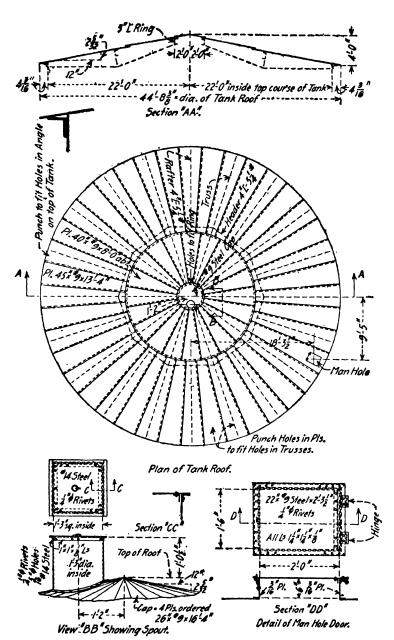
Details of Steel Roof for Steel Bins for Independent Elevator.
